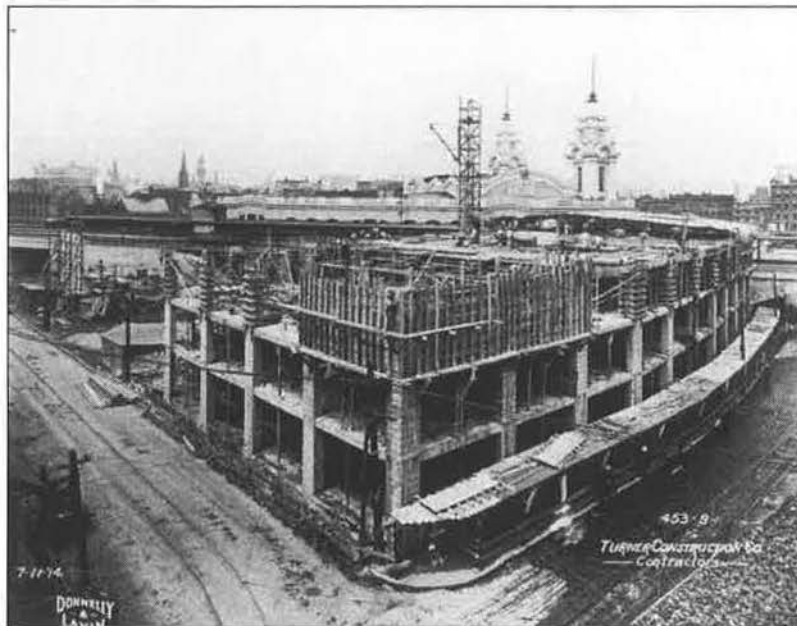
The Osgood Bradley Building during construction, view looking northwest (Turner Construction Co. contractors, July 11, 1914; Worcester Historical Museum)
